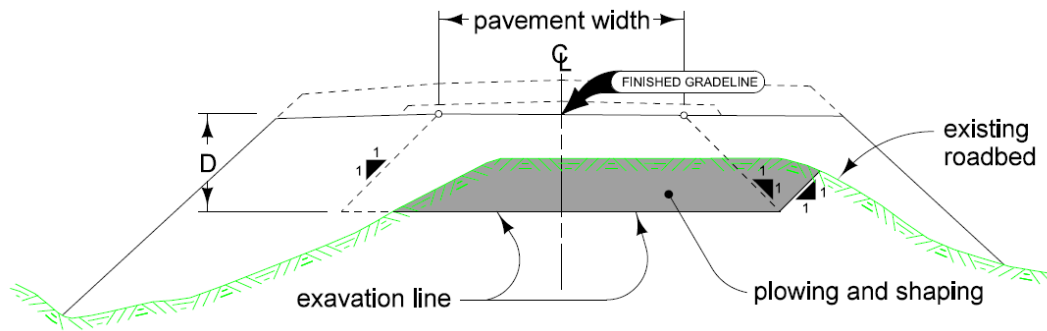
Existing roadbed inside of proposed roadbed as outlined in Case 1.
